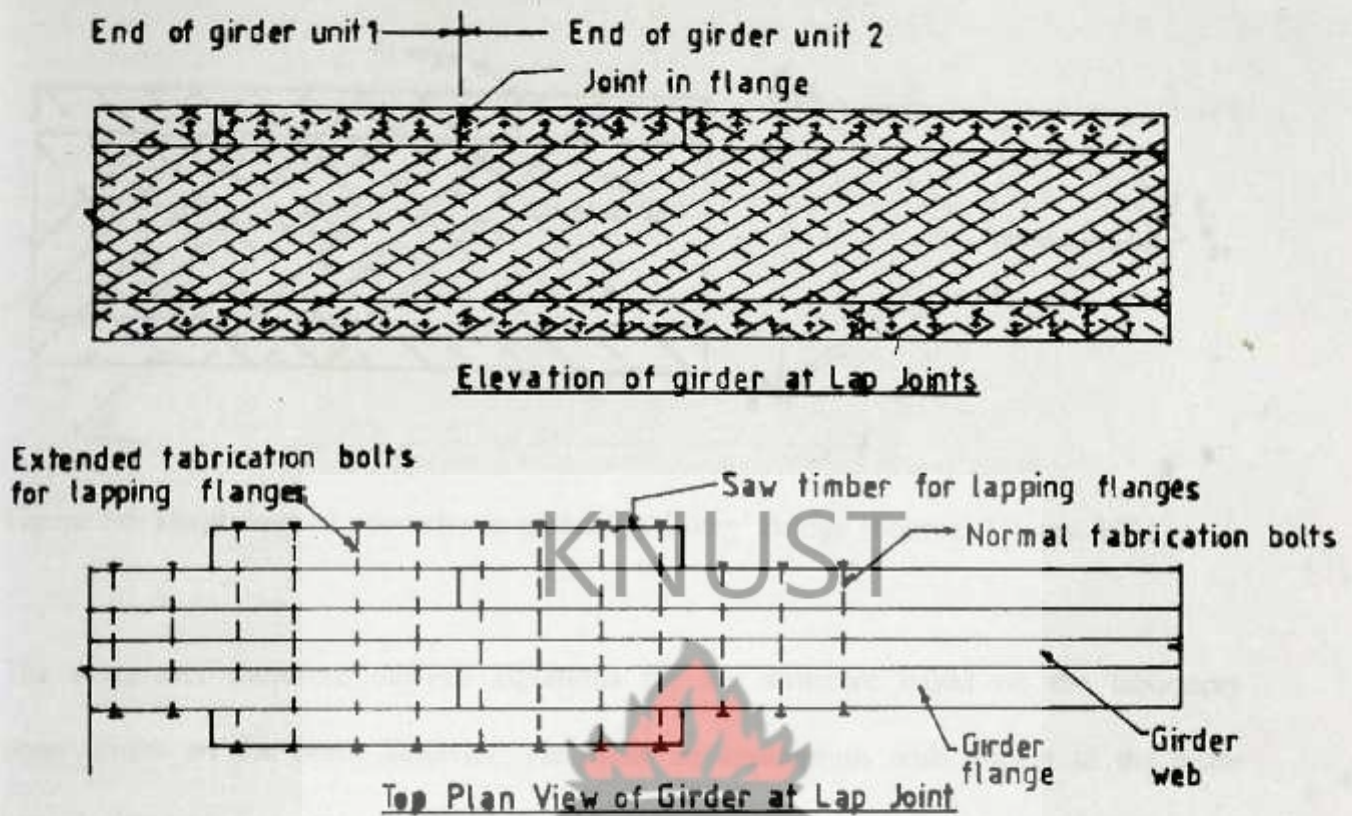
Elevation and Plan views of Allotey's Bridge (Source: Allotey, 1991)
